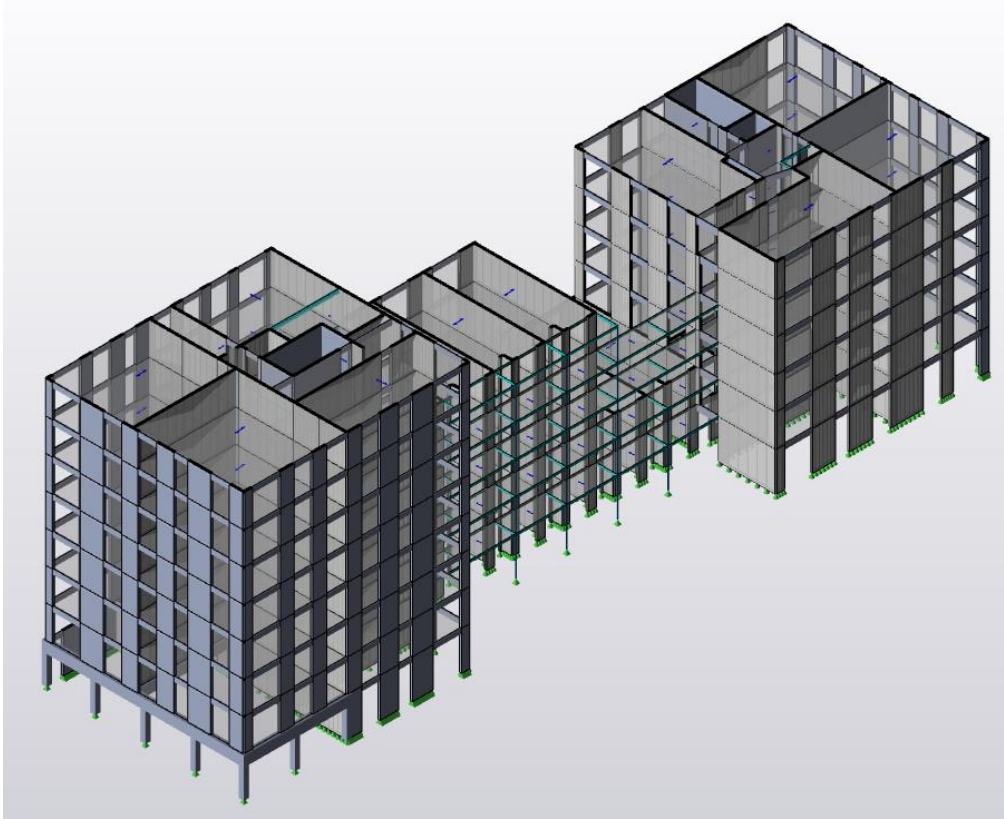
Blocks C northern wing superstructure with precast slabs on masonry / RC cross wall construction (view from northeast)
